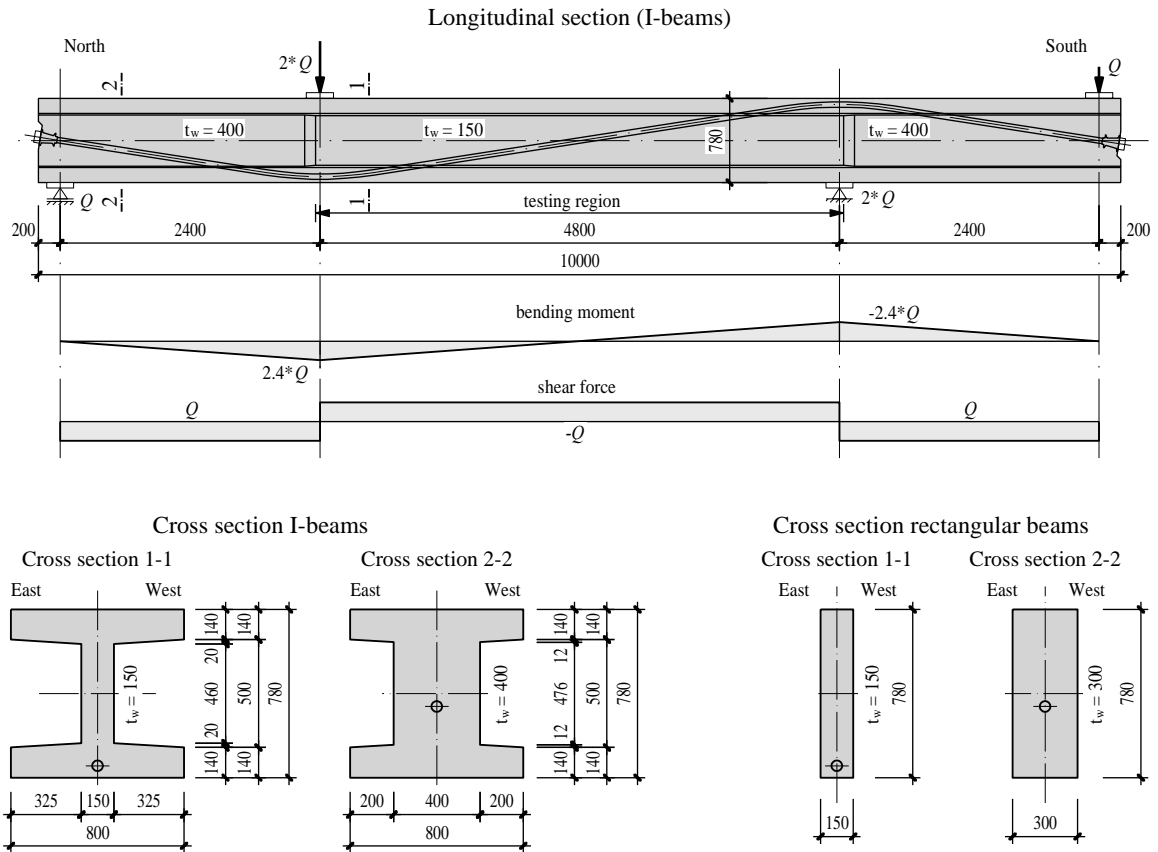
Test setup, bending moments, shear forces and dimensions of the test specimens (dimensions in [mm]).
